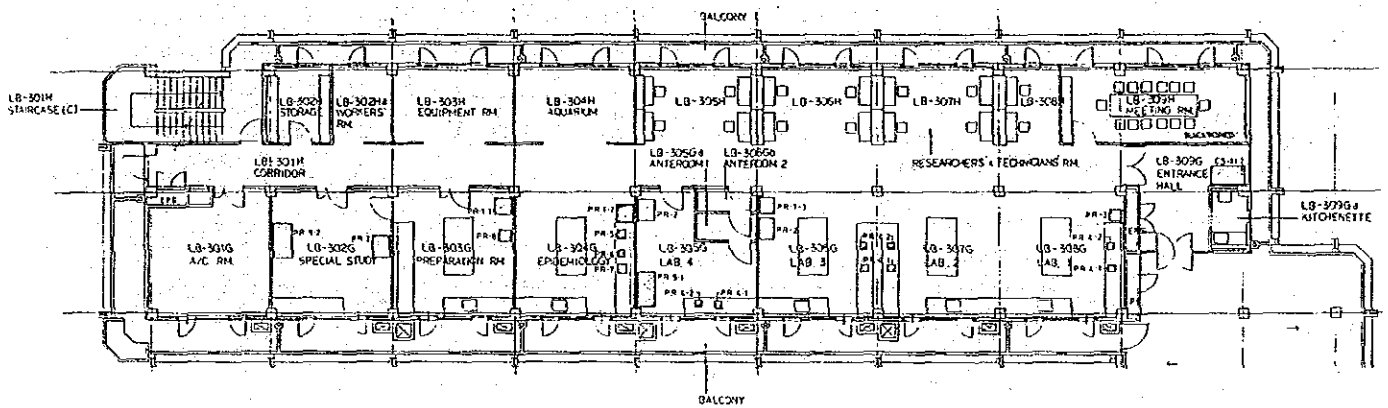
PLANNING OF PARASITOLOGY SECTION
